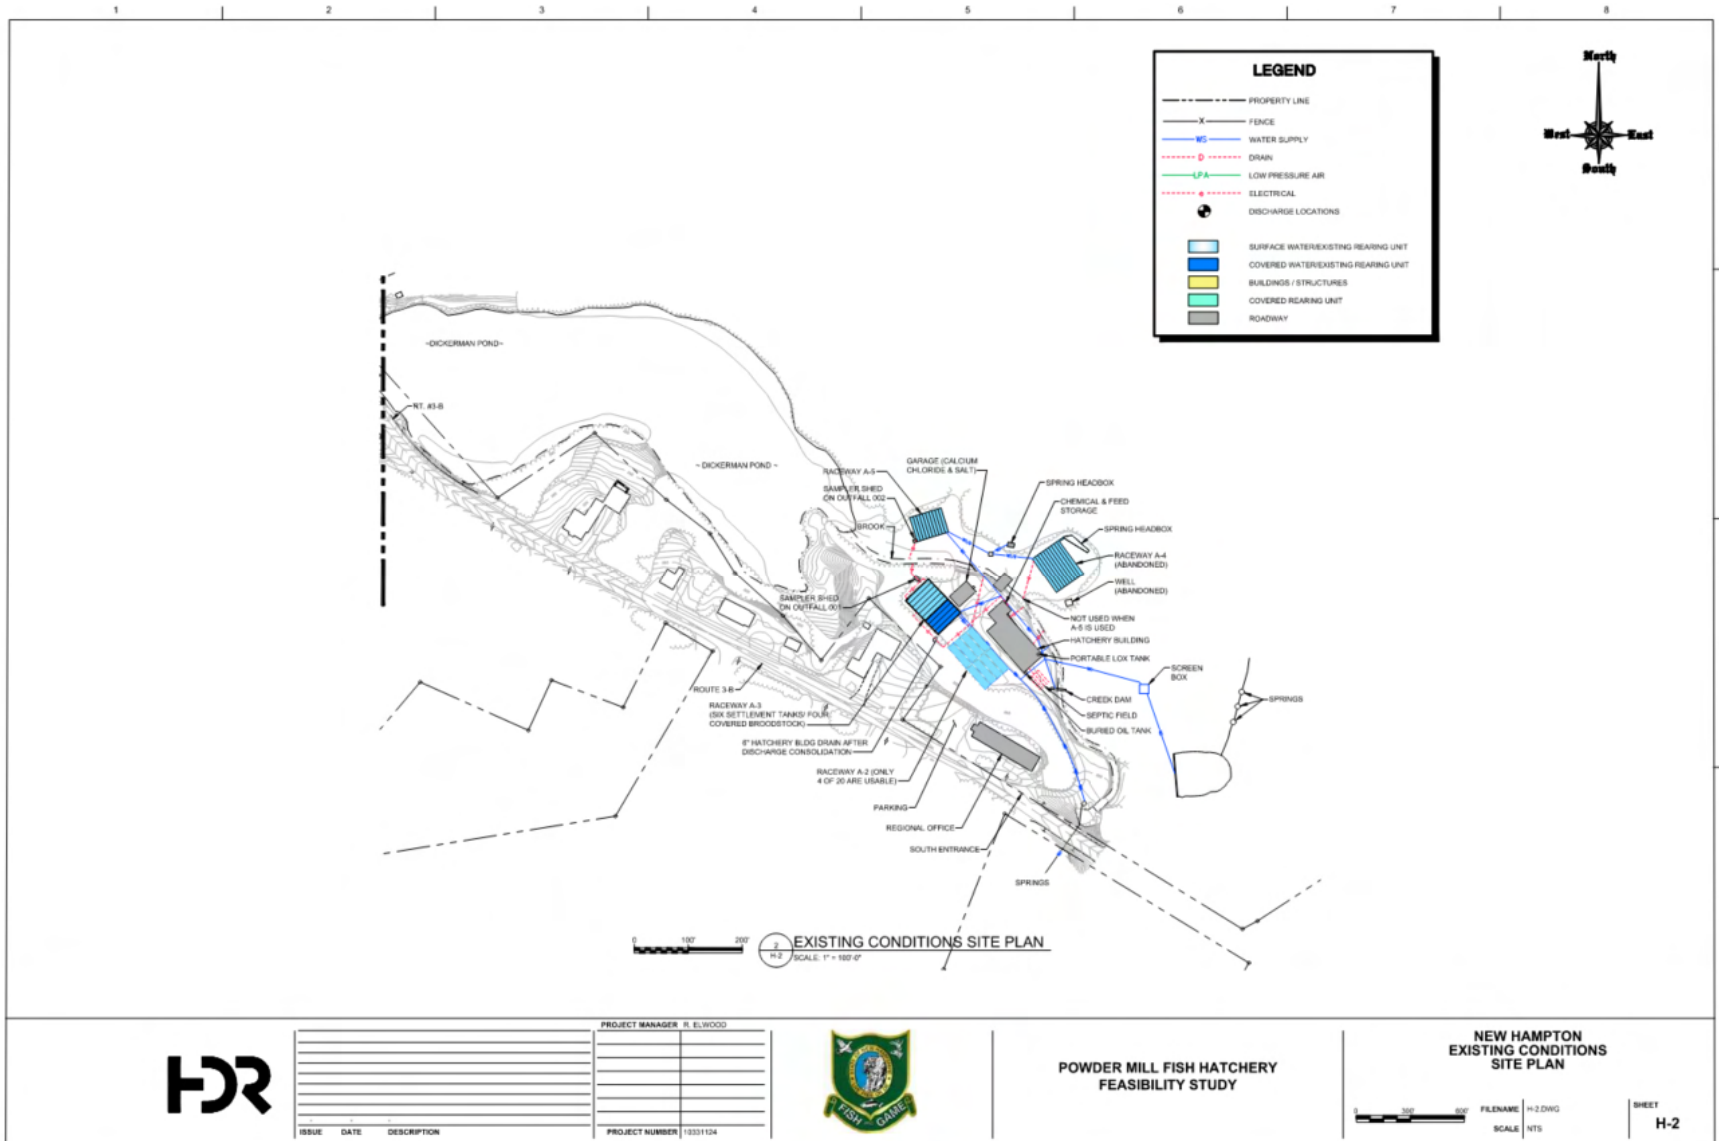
Existing New Hampton Site Plan B- and C-Series
